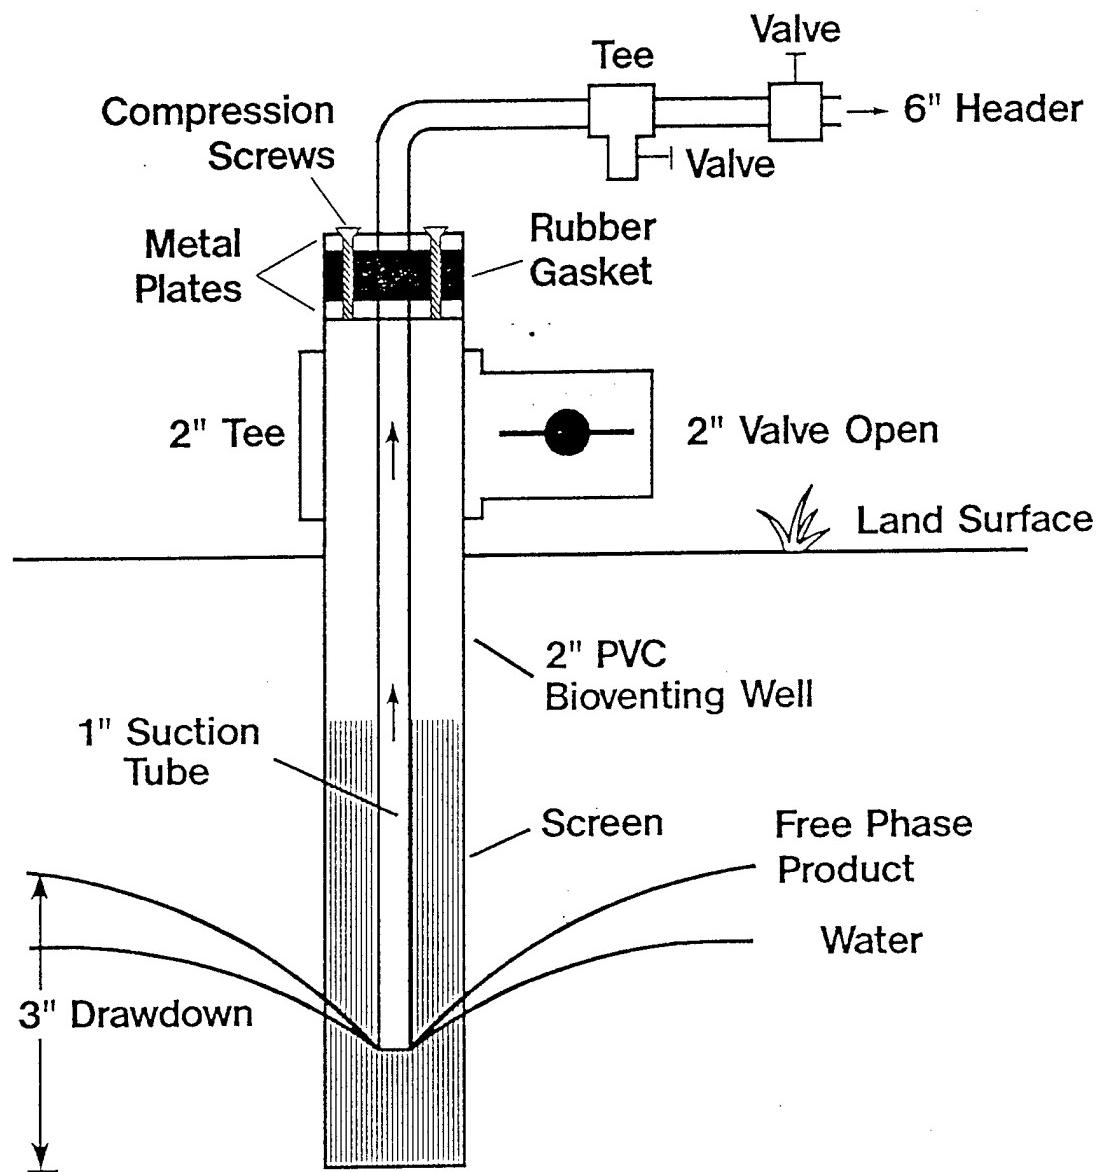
Slurper Tube Placement and Valve Position for the Drawdown Pump Test
